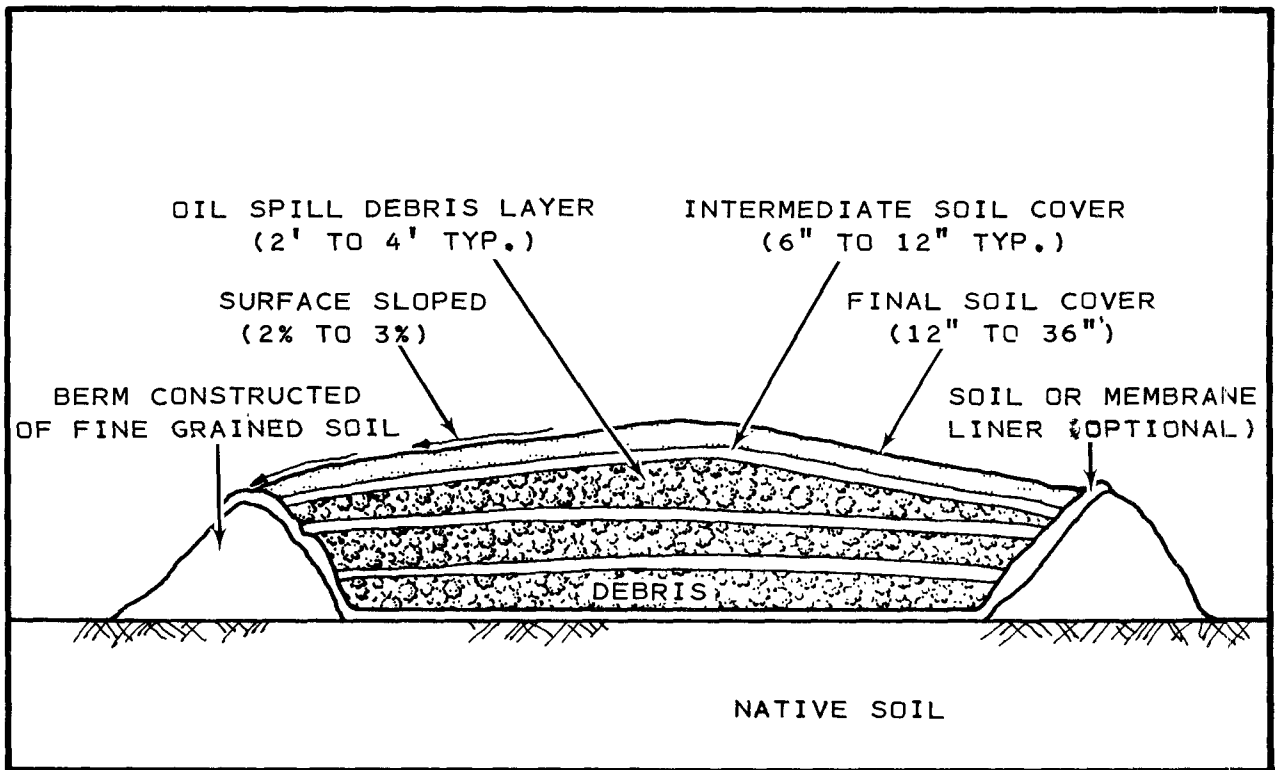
TYPICAL CROSS-SECTION OF AN ABOVE-GRADE DEBRIS DISPOSAL SITE.
